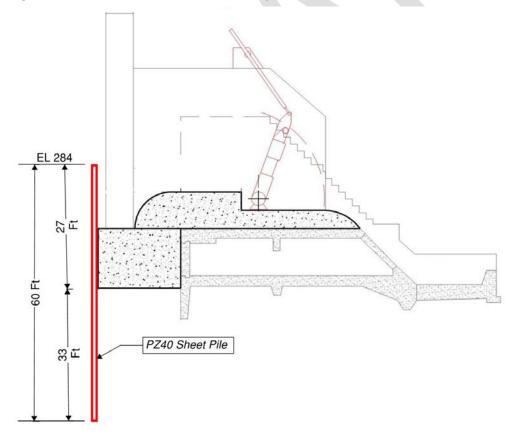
Construction Cofferdam Option 3 – Sheet Pile Section
